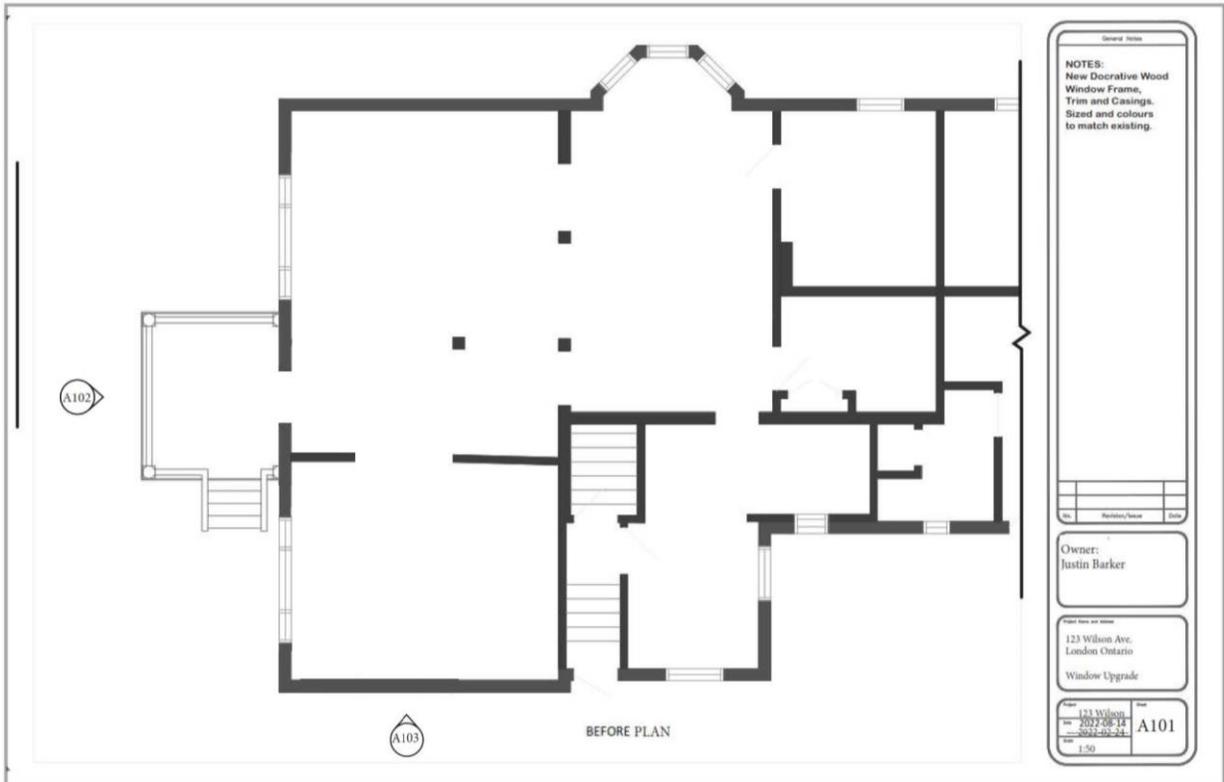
Floor plan drawing, submitted as part of the Heritage Alteration Permit application, showing the existing floorplan with the existing windows. Note: existing large window on the south façade not shown.
